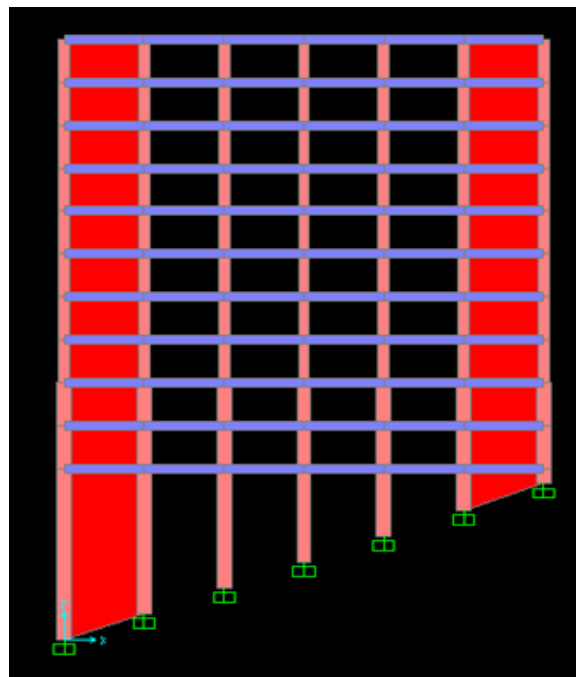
Building model with shear walls provided at peripheral corners on 20° slope ground.
